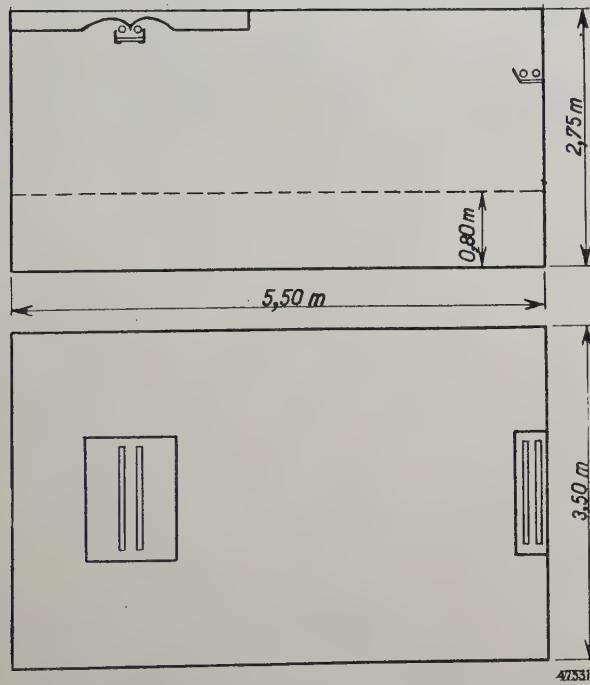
Plan and elevation of the test room with the two fittings: one let into the ceiling (which was somewhat lower over one half of the room) and one in a cornice on the narrow wall of the room.
